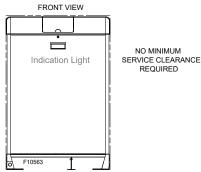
Minimum Clearances from Combustible Surfaces - Indoor and Outdoor Installations
